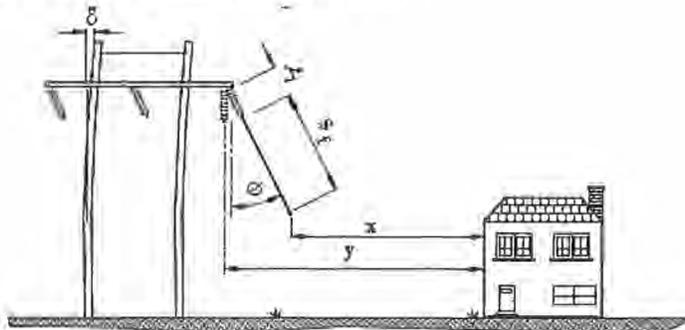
HORIZONTAL CLEARANCE REQUIREMENT TO BUILDINGS
